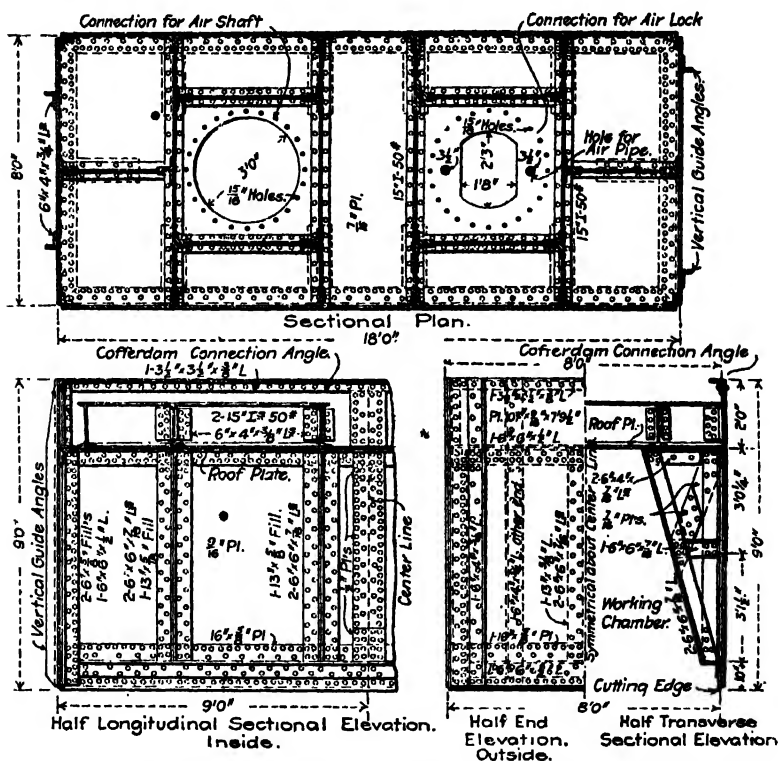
Caisson for Wall Column, Mutual Life Building, New York.
